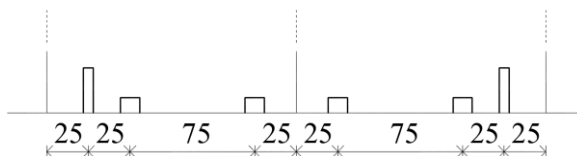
First attempt arrangement of the connection of the designed segmented wall (measures in cm).
